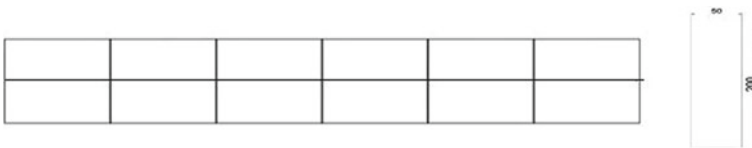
Cross section of beam with flat web and stiffener and dimensions of stiffener
